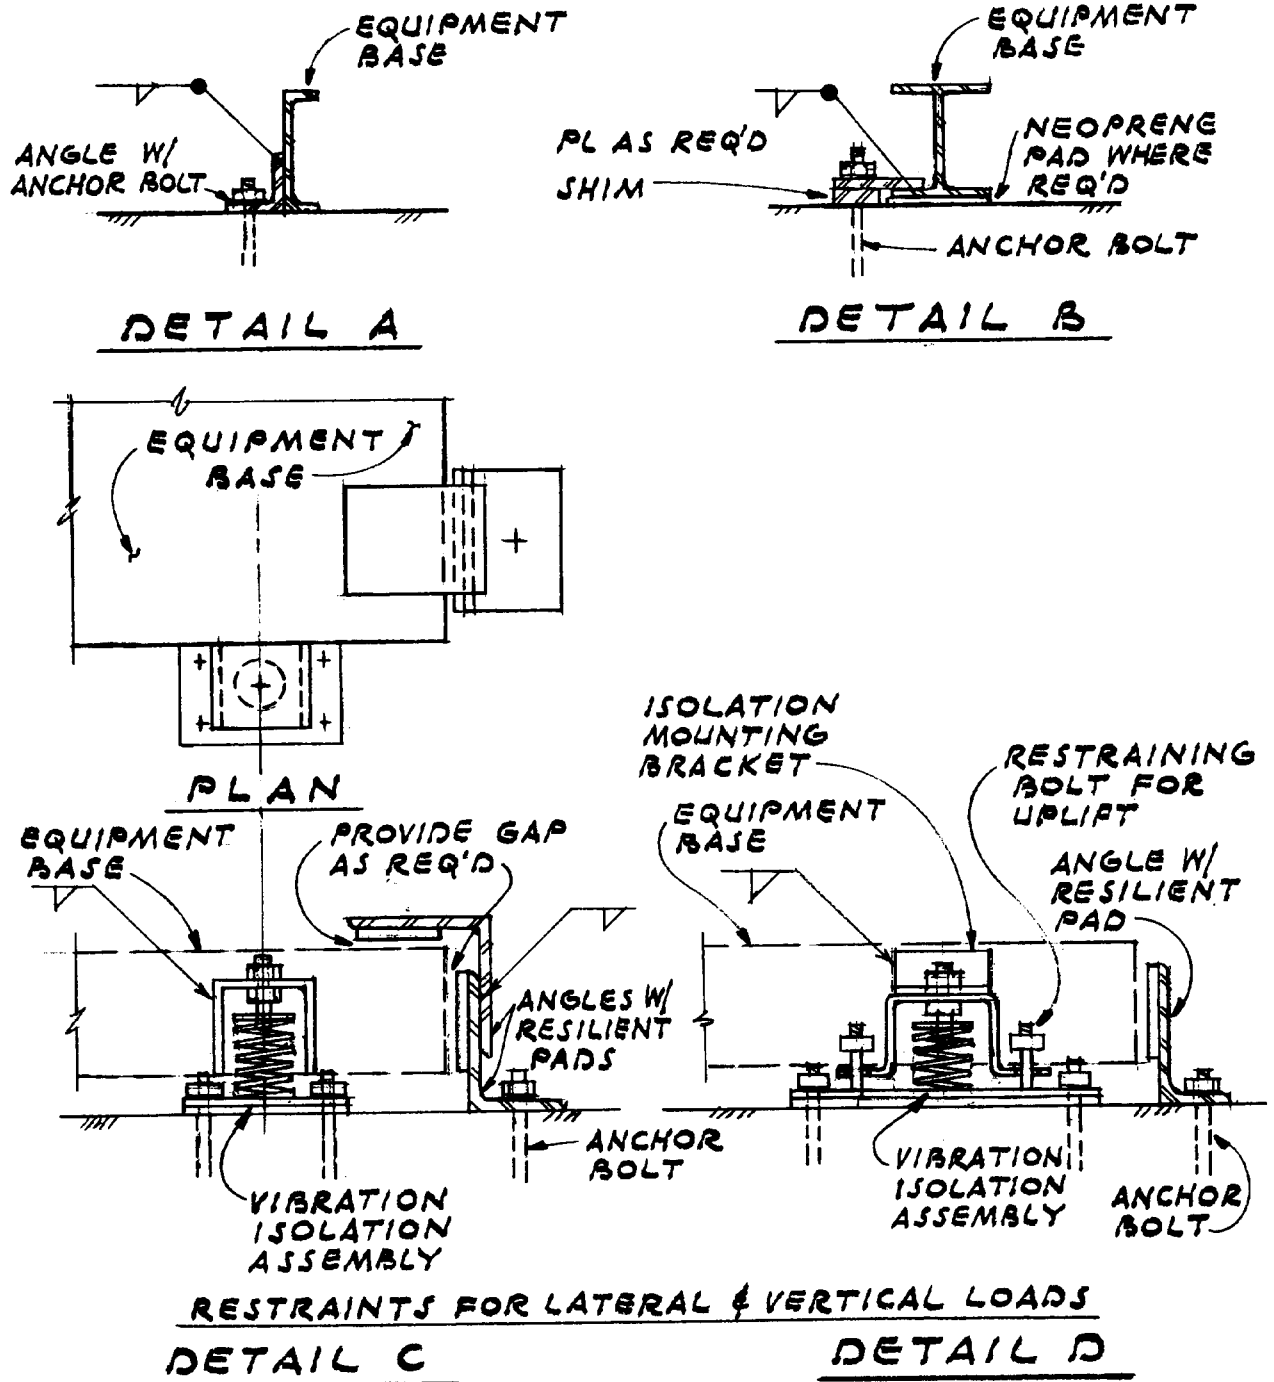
Typical seismic restraint of floor-mounted equipment.
